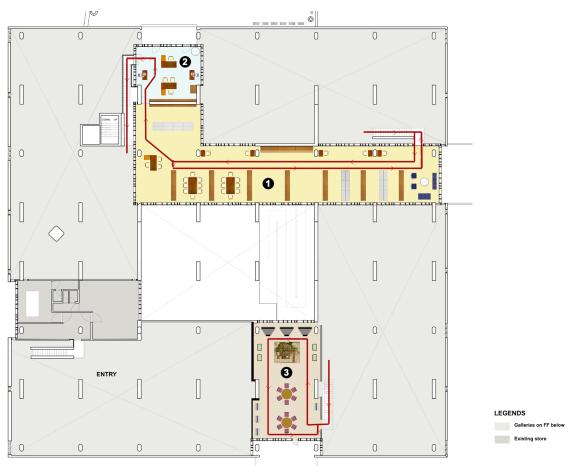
Proposed layout of reuse and interpretation of Second Floor
